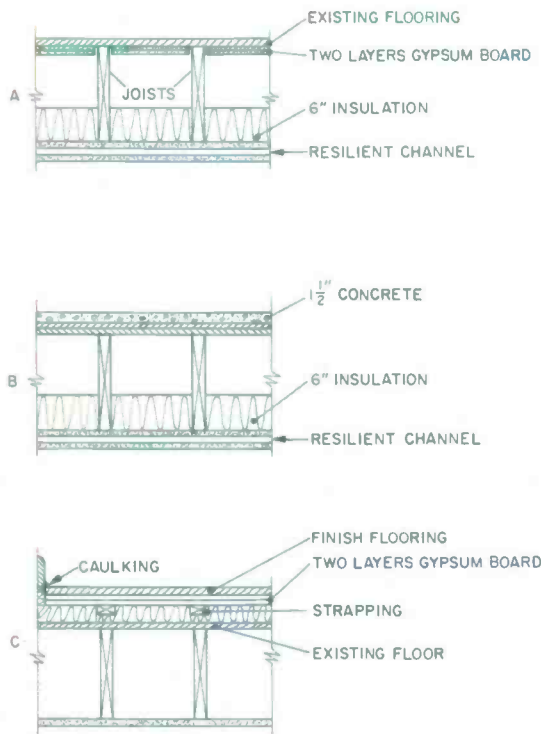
Three approaches to strengthening the floor/ceiling or ceiling/floor boundaries of a room, requiring access to the ceiling alone (A), both floor and ceiling (B), and floor alone (C).
